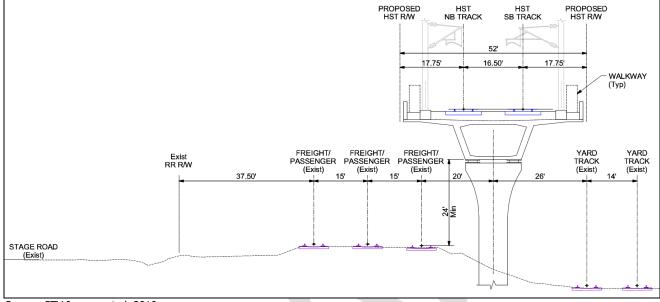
Typical Cross-Section – La Mirada Rail Yards – Aerial Option
